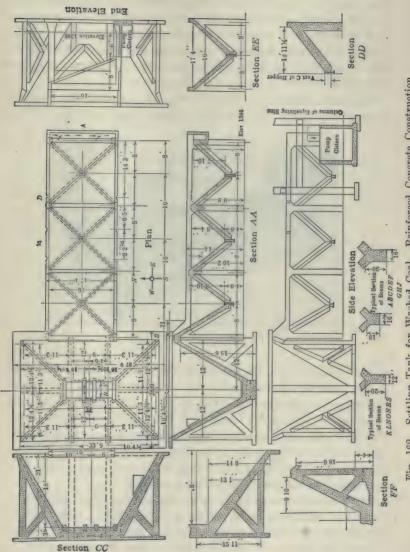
Settling Tank for Washed Coal. Reinforced Concrete Construction
